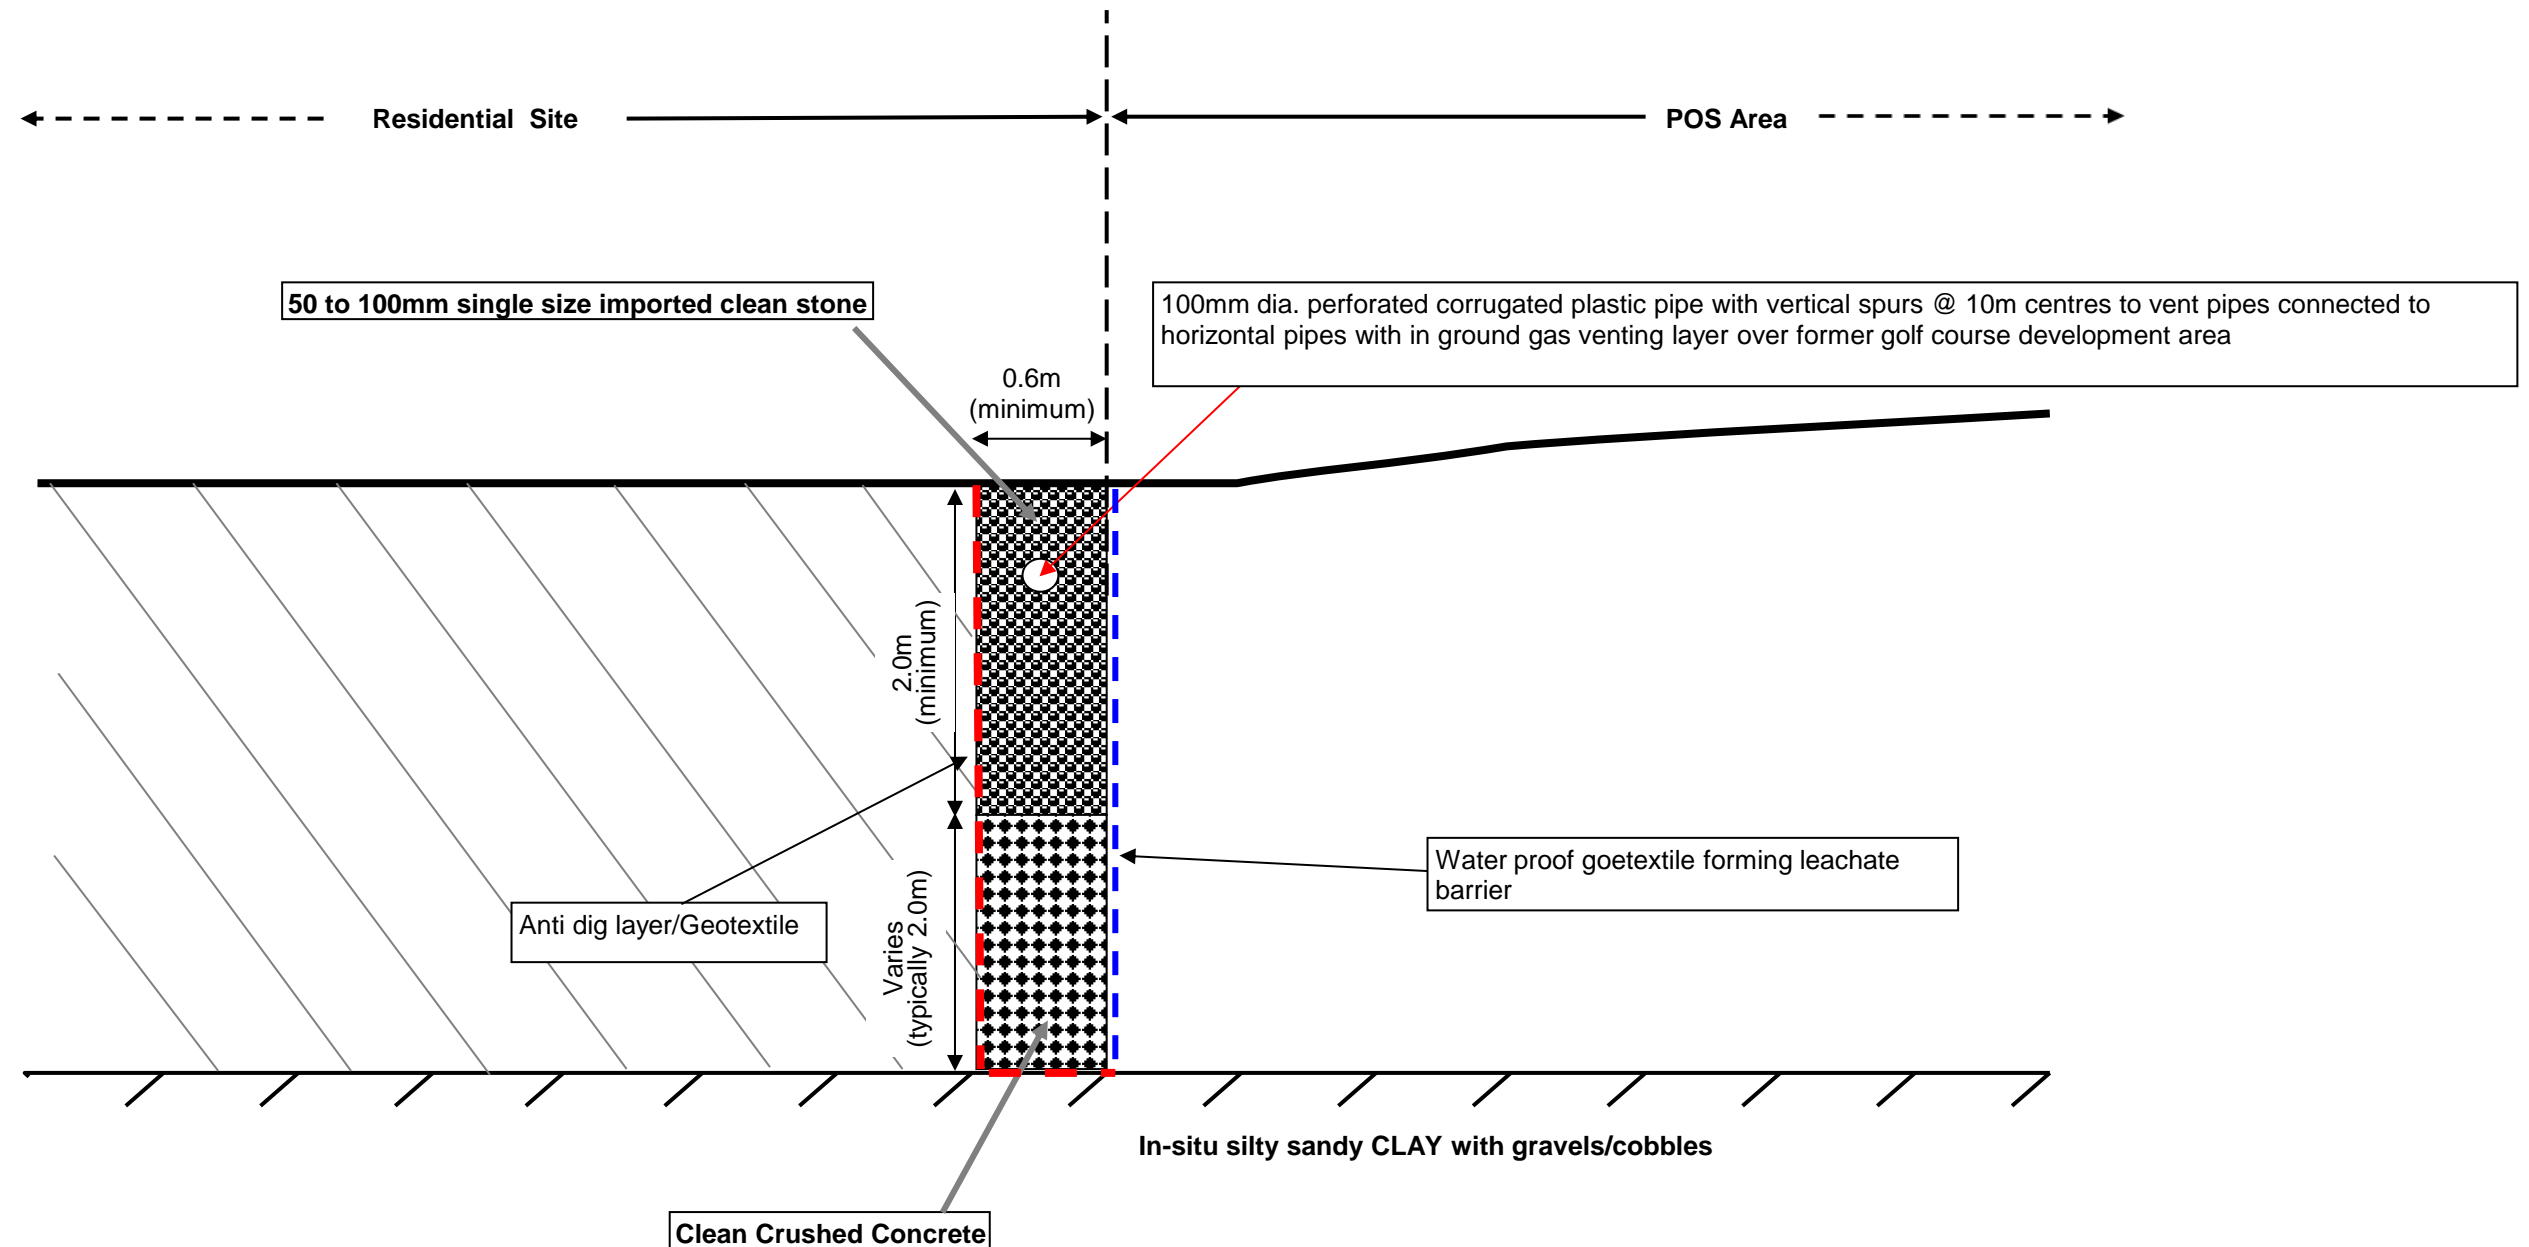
TYPICAL GAS CUT-OFF TRENCH DETAIL
